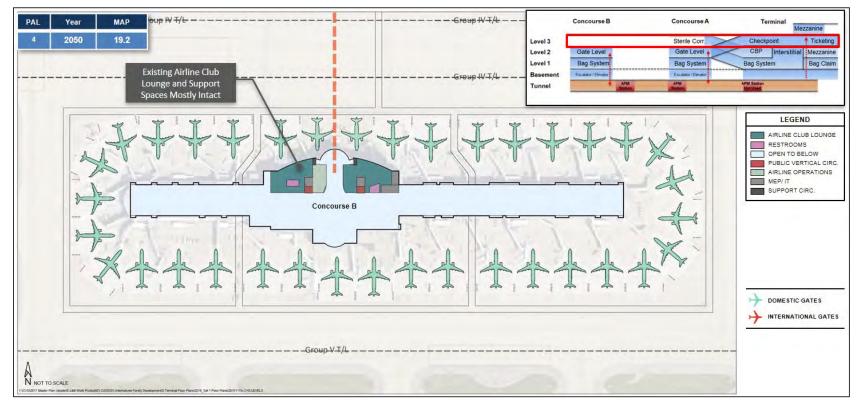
PAL 4 ENLARGED FLOOR PLAN – LEVEL 3 CONCOURSE B
